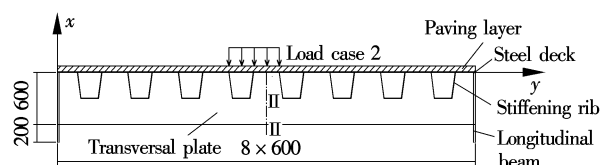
Analytical model of orthotropic steel deck surfacing (unit: mm)
